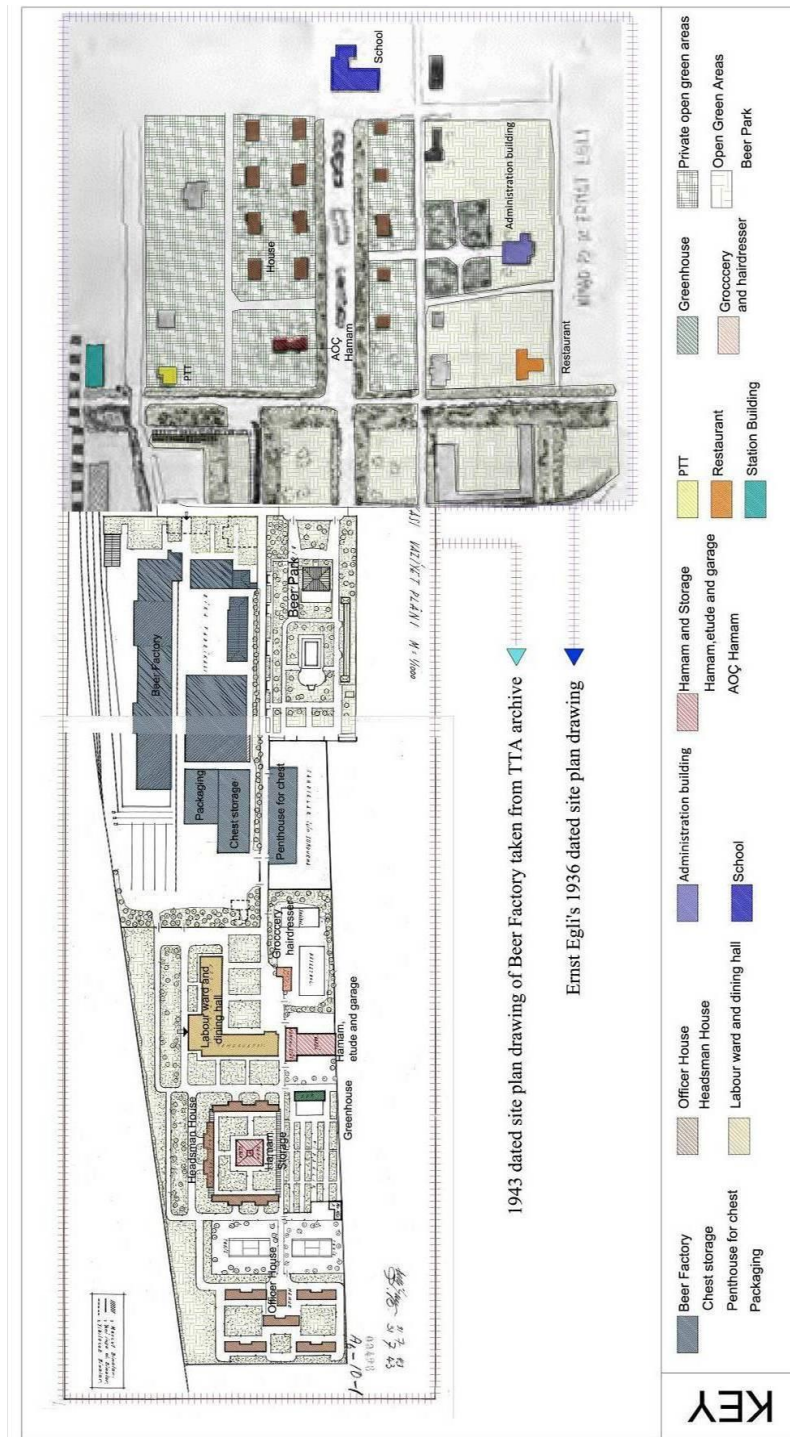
Site plan (1936-1943 dated maps)(TTA Archive)
